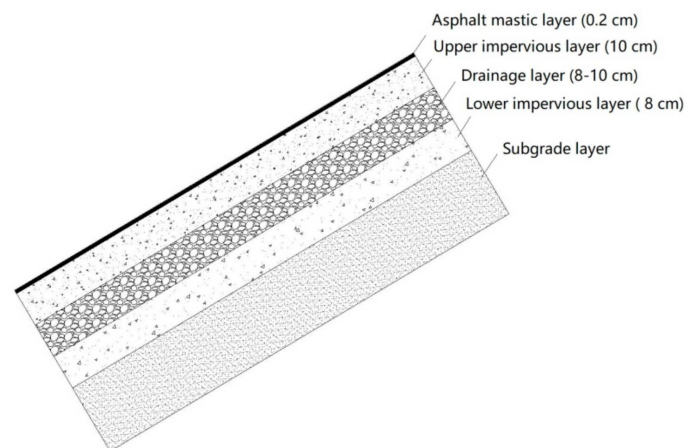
Cross section of Zhanghewan asphalt concrete facing.
